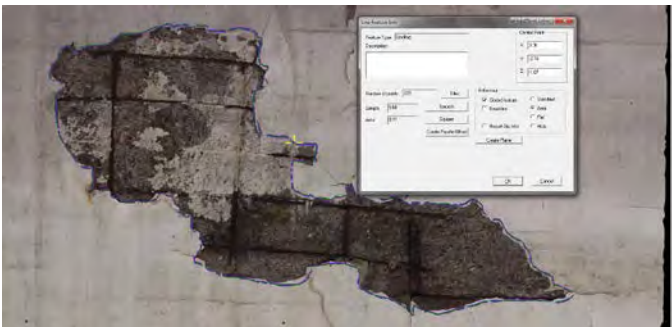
Information on spalling by ventilation shaft—coordinates of center point and area.
